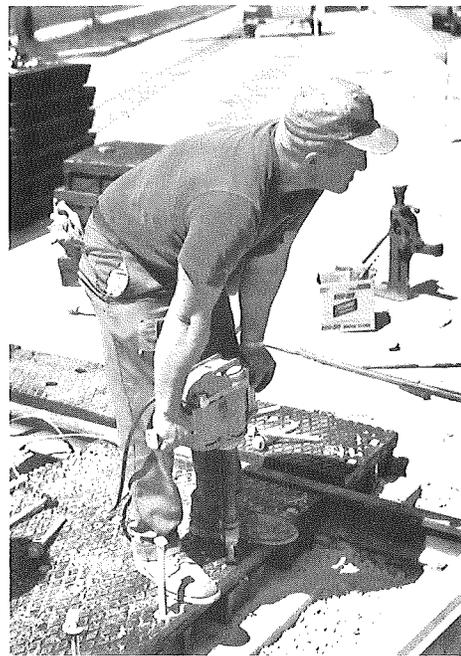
Fastening pads to ties with 3/4-in. lag bolts.
